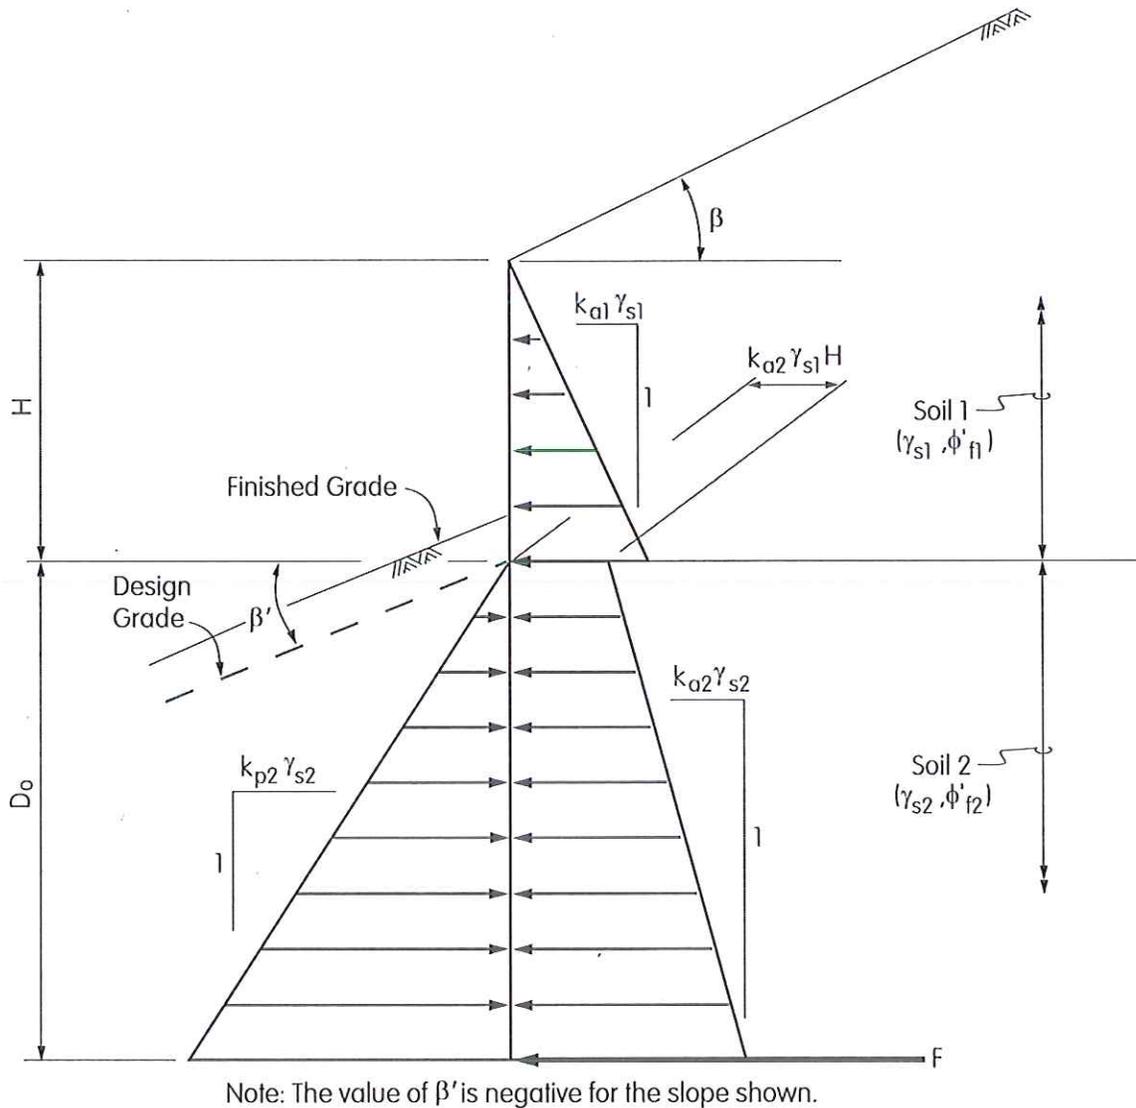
Simplified Lateral Earth Pressure Distributions for Permanent Non-gravity Cantilevered Walls with Vertical Wall Elements Embedded in Granular Soil and Retaining Granular Soil
